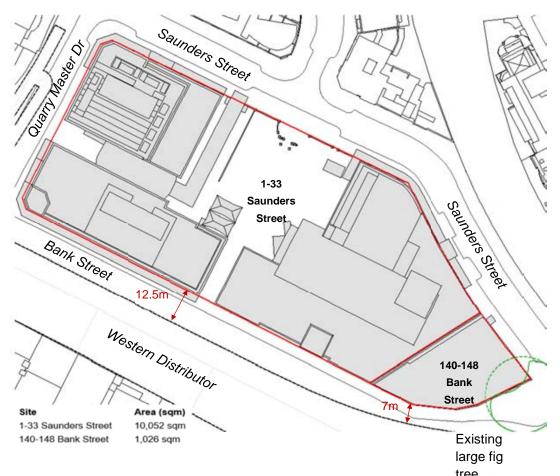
existing site plan for 1-33 Saunders Street & 140-148 Bank Street
